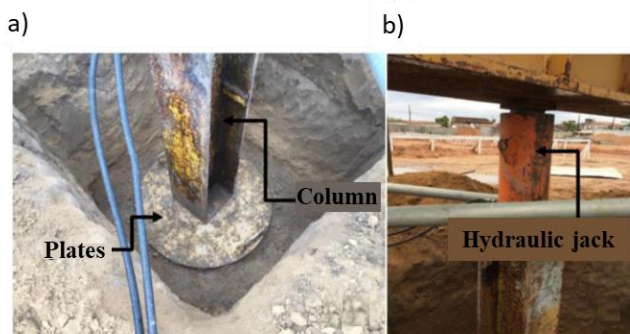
Positioning: a) Bottom plate and column b) Top plate and hydraulic jack.
